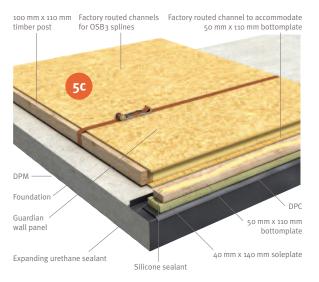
Bring Wall Panels Together Using Ratchet Straps
